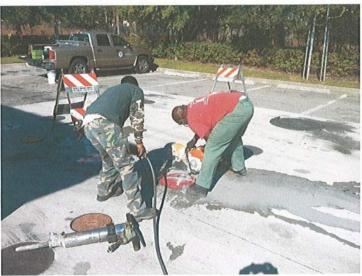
View of the removal of the concrete surrounding the diesel fill bucket
